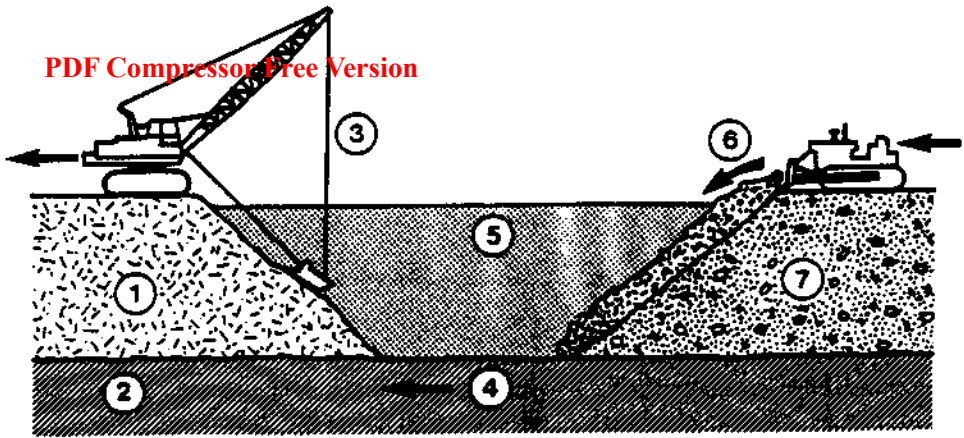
Slurry trench technique 1) Permeable virgin ground, 2) Substratum, 3) Excavation, 4) Direction of progress, 5) Trench filled with bentonite slurry, 6) Filling with aggregate, 7) Finished trench (ICOLD 1985).
